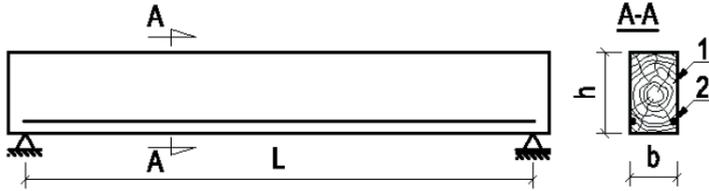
Strengthening of wooden beams using the reinforcing bars; 1-wooden beam reinforced, 2- adhesive composition with a reinforcing rod, [5]
